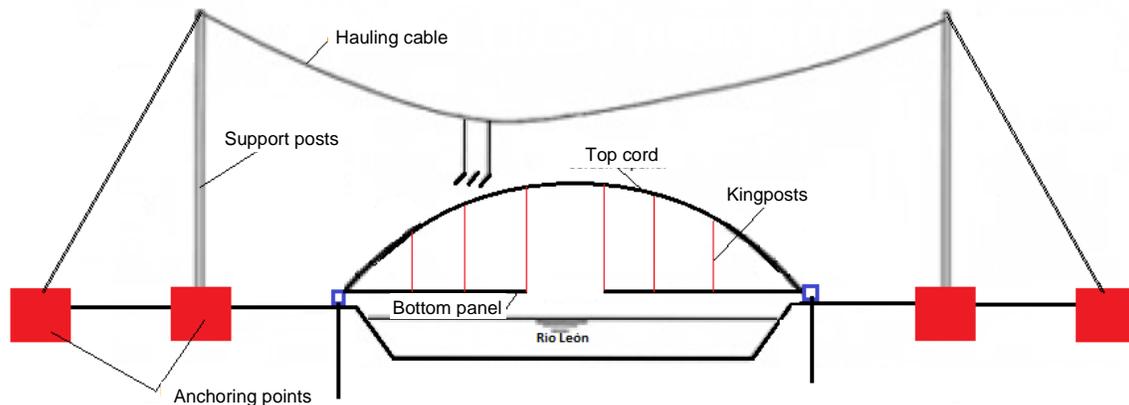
Longitudinal elevation assembly of kingposts and lower board
